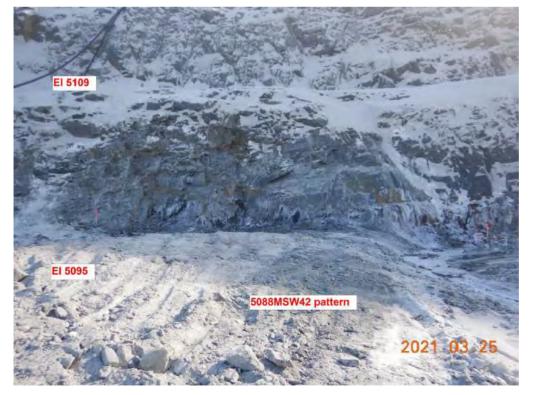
Pit seepage along south wall, looking south (March 25, 2021).
